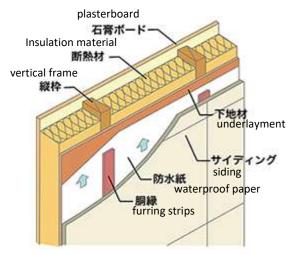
2x4 construction method (Source: Japan 2x4 home builders association Tohoku)
